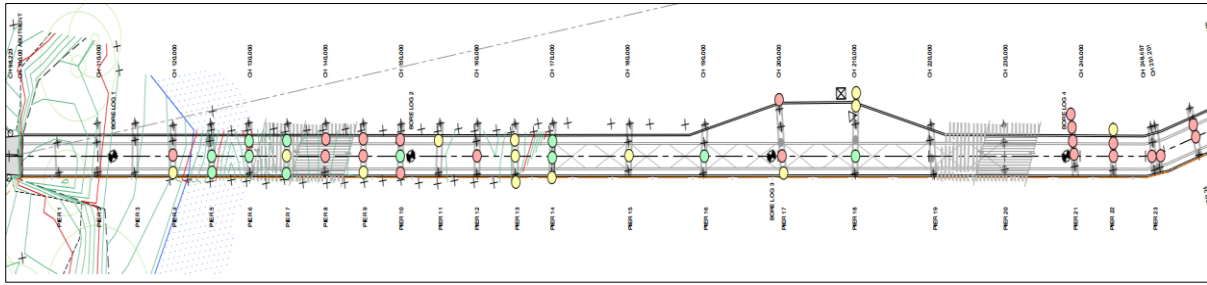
Bridge Plan Enlargement 1 (Source: Ref [1])
